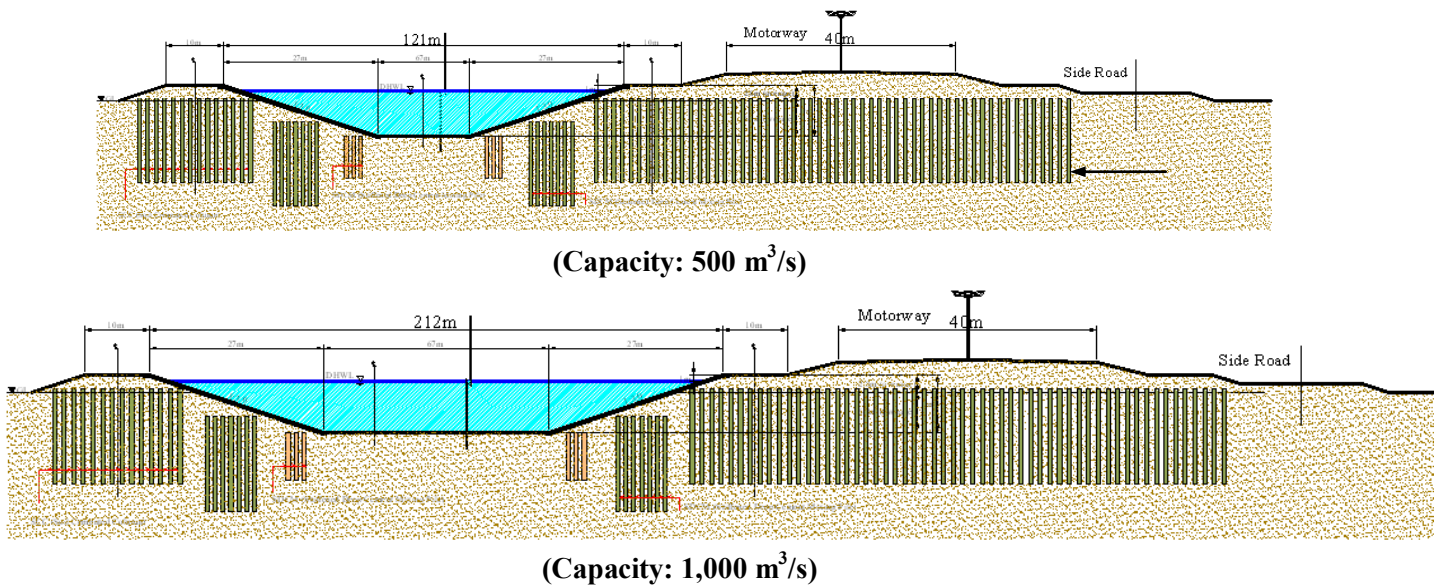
Cross Section of Outer Ring Road Diversion Channel¹
